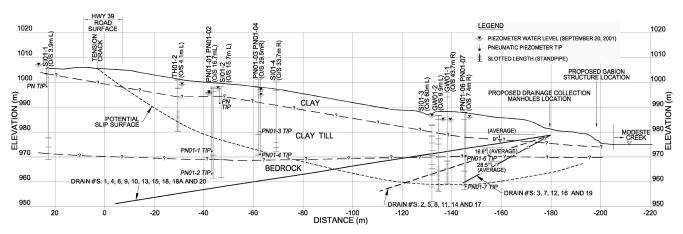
Cross section showing subsurface conditions, inferred shear plane, and subhorizontal drains.
